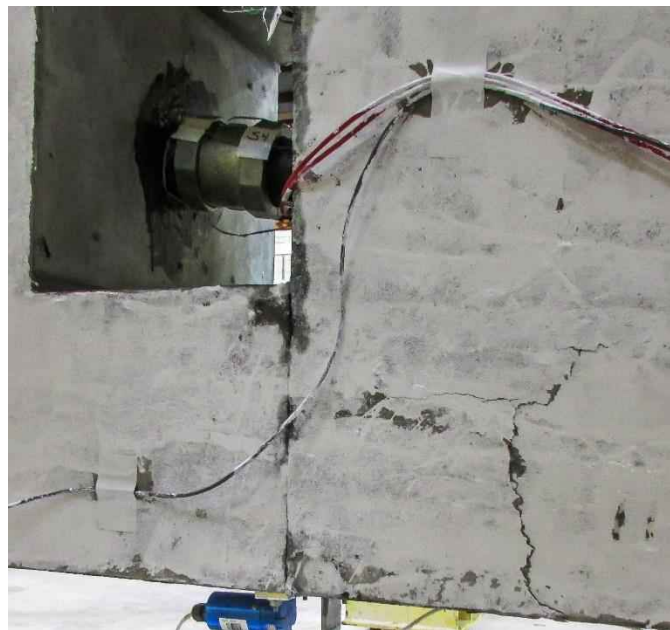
Cracking in concrete surrounding shear key
